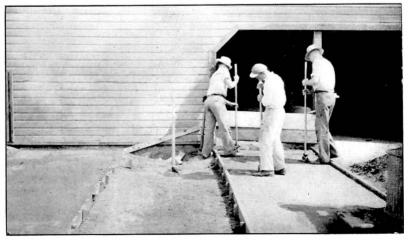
BUILDING A SOIL-CEMENT FLOOR.
